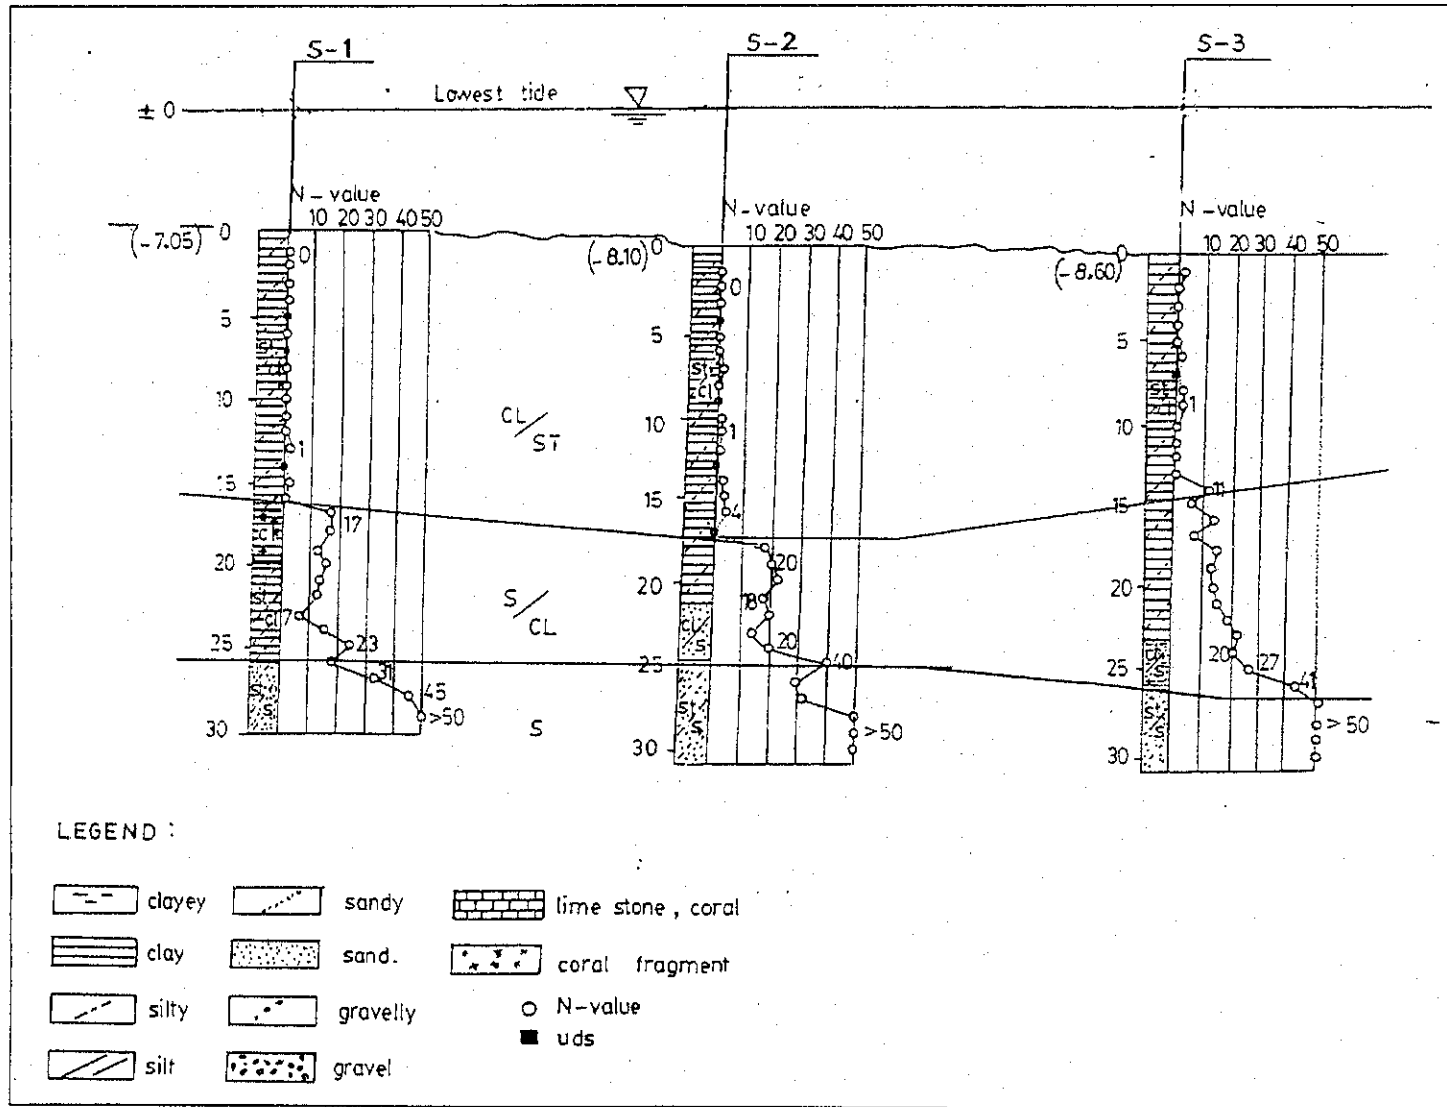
Soil Profile in Cebu South Site
